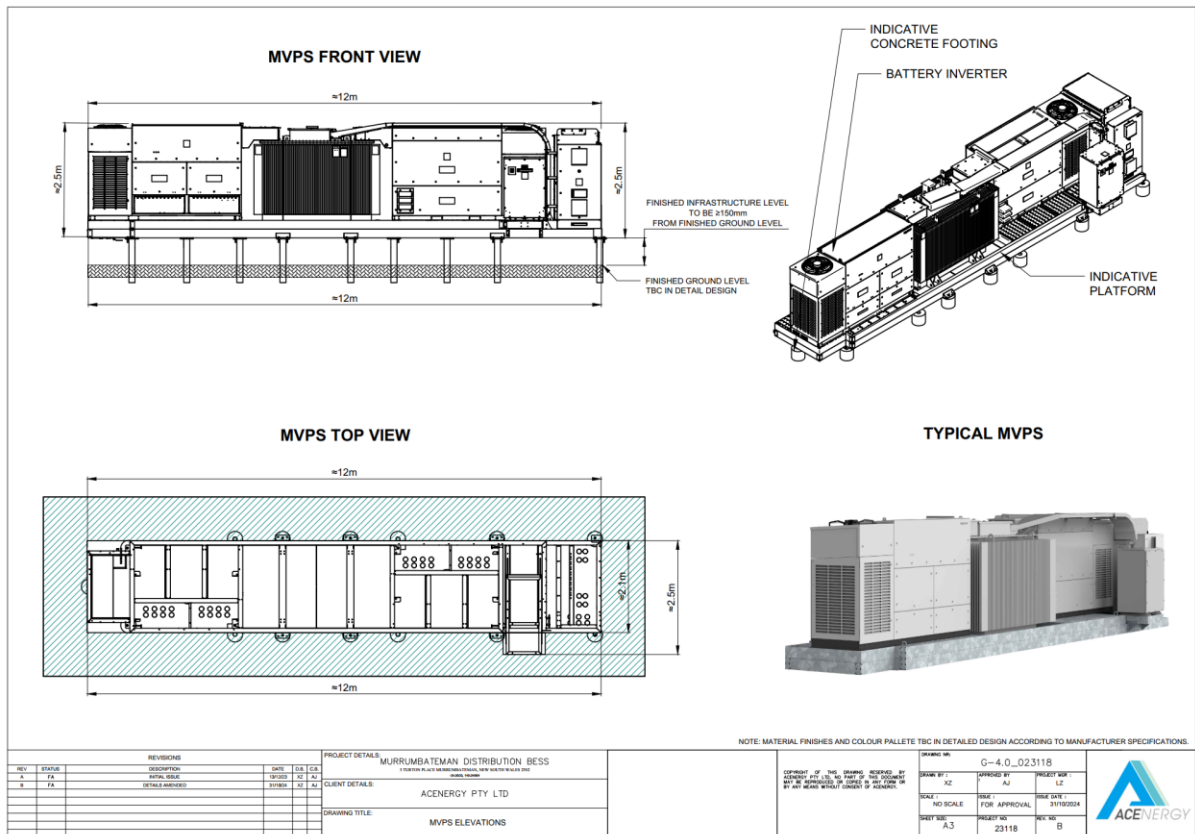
Typical Multi Voltage Power Station (MVPS) Plan
